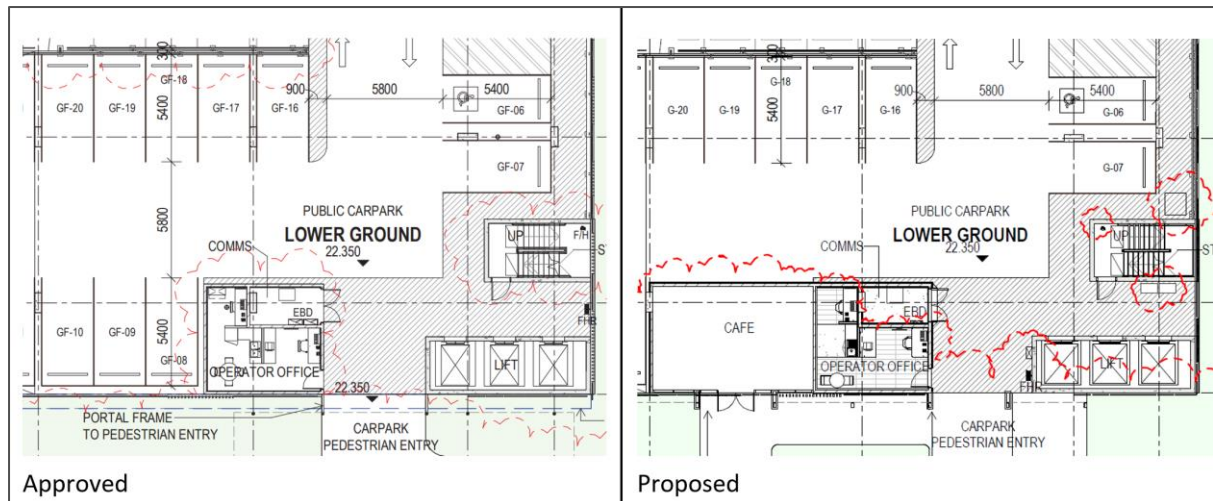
| Approved and proposed lower ground floorplan (café, north-east corner) (Source: Modification Report)
